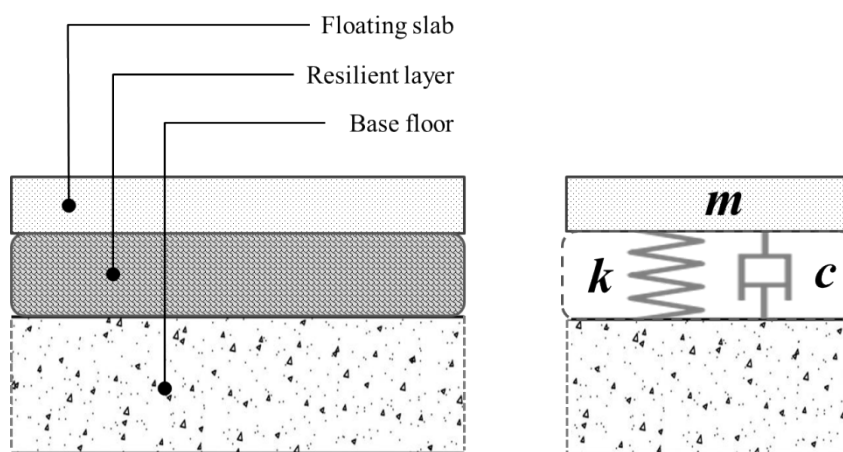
Section of a floating floor built on a concrete base floor and the mechanical model, in which resilient layer is defined by its stiffness (spring of elastic constant k) and damping (dampener of dissipative constant c) and the floating slab by its inertia (mass m).
